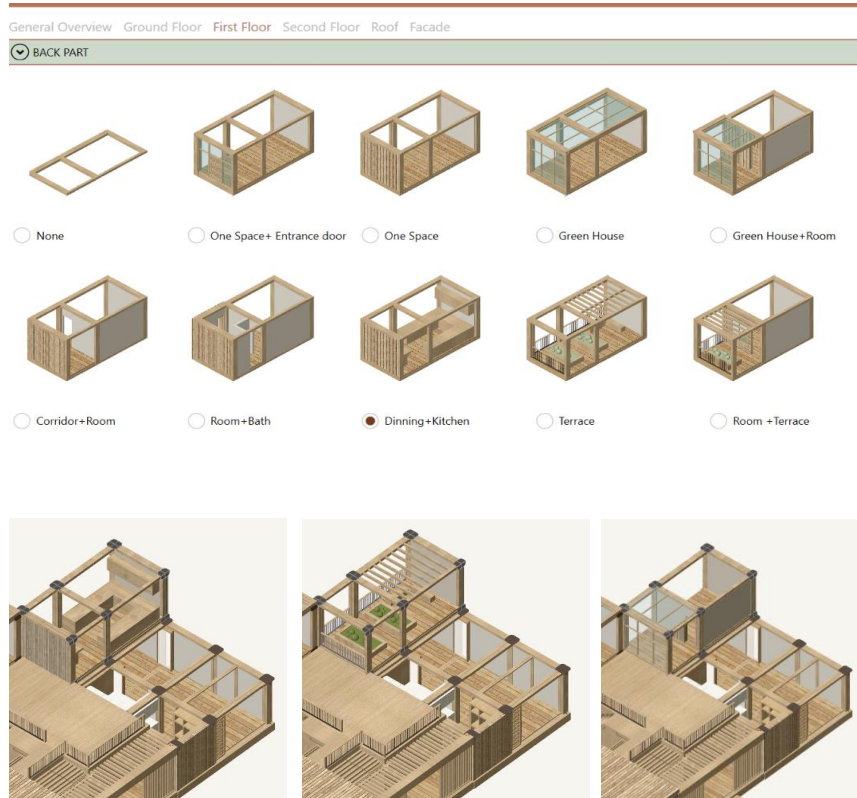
First Floor Addition: Configurator Layout and Section Options(Back Part) (by the author)
